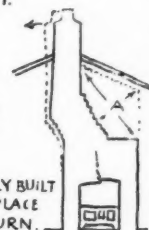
ECCENTRICALLY BUILT CHIMNEY CRACKS FIREPLACE ARCH & TENDS TO OVERTURN.
